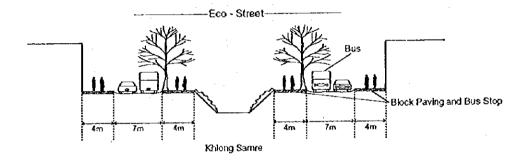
Images of Cross Section of Secondary Road with Eco-Street
